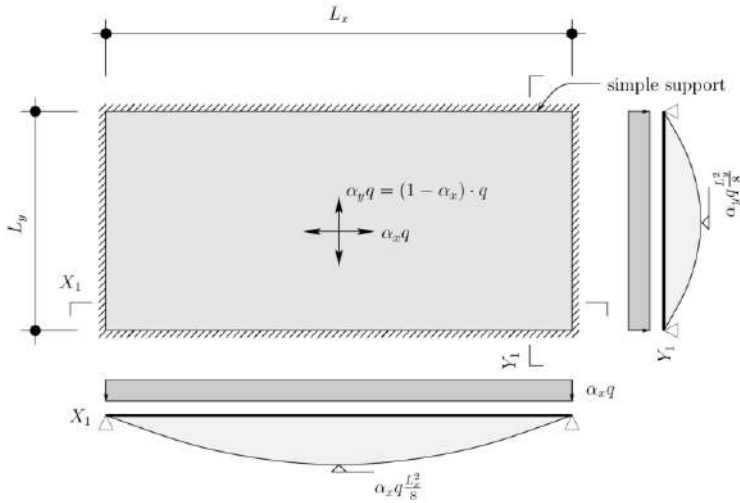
Design of a new structure using a lower-bound, example of a slab
